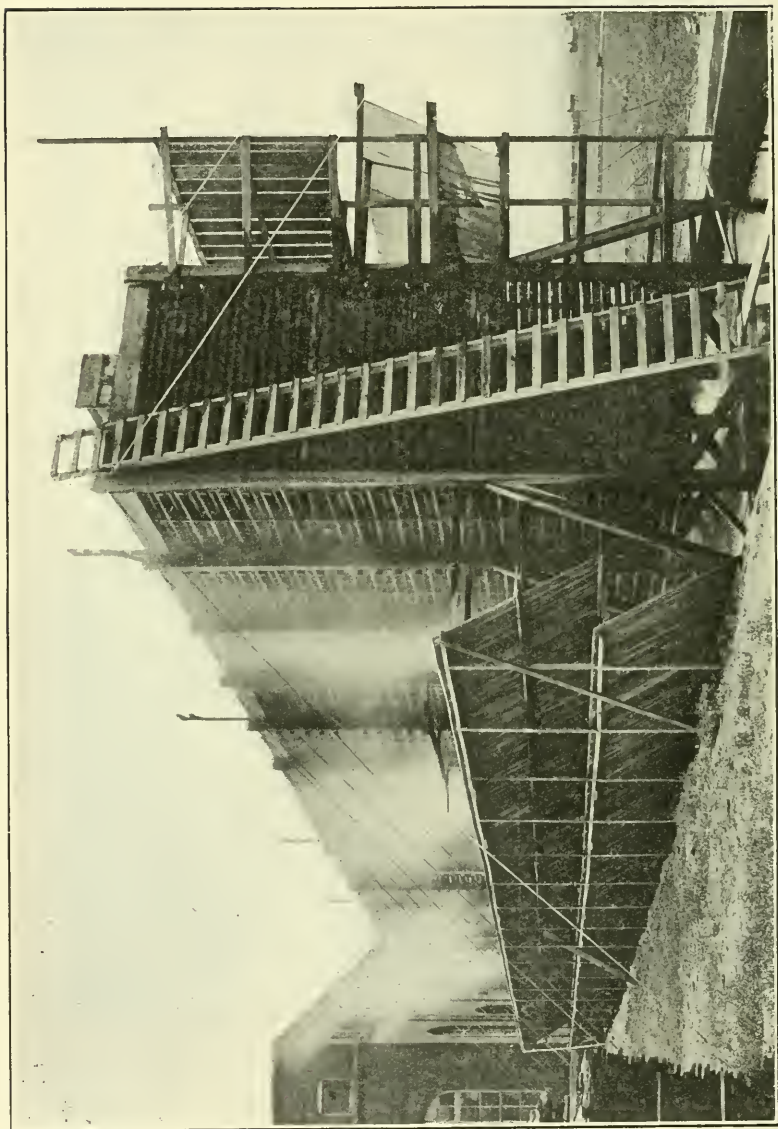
2900-H.P. OPEN-TYPE WOODEN TOWER AT COLORADO SPRINGS FOR A LOW-PRESSURE TURBINE
